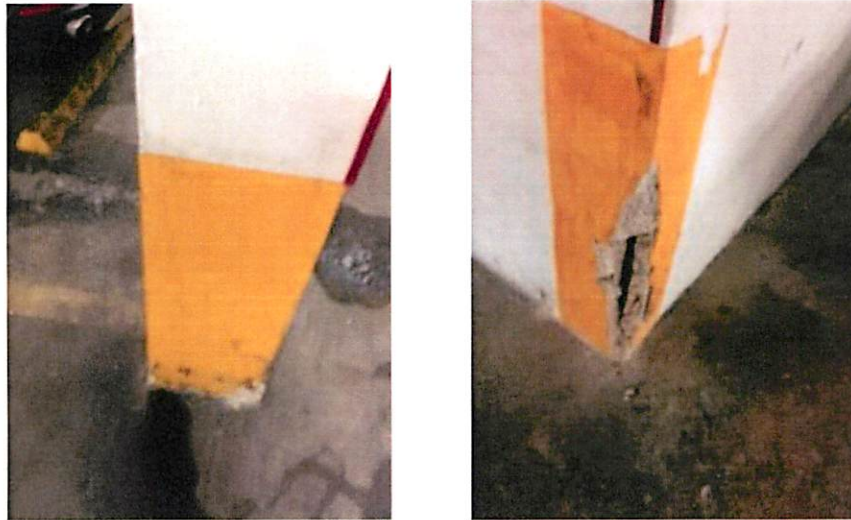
Typical cracking and spalling at parking garage columns
